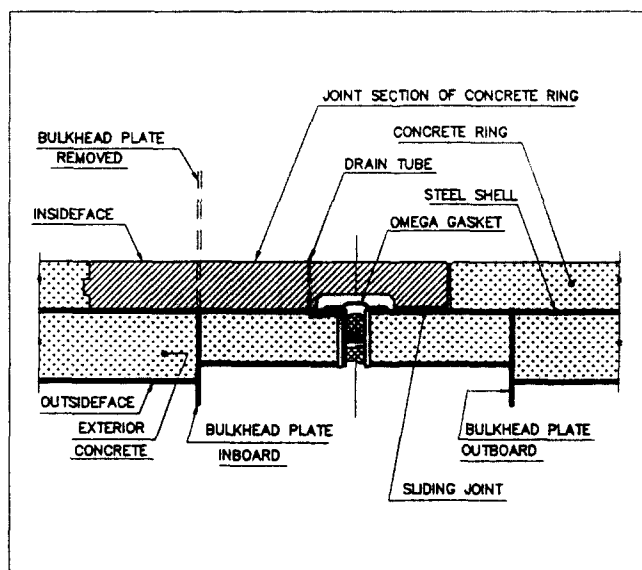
Intermediate joint with sliding arrangement for a double-steel-shell tunnel.
